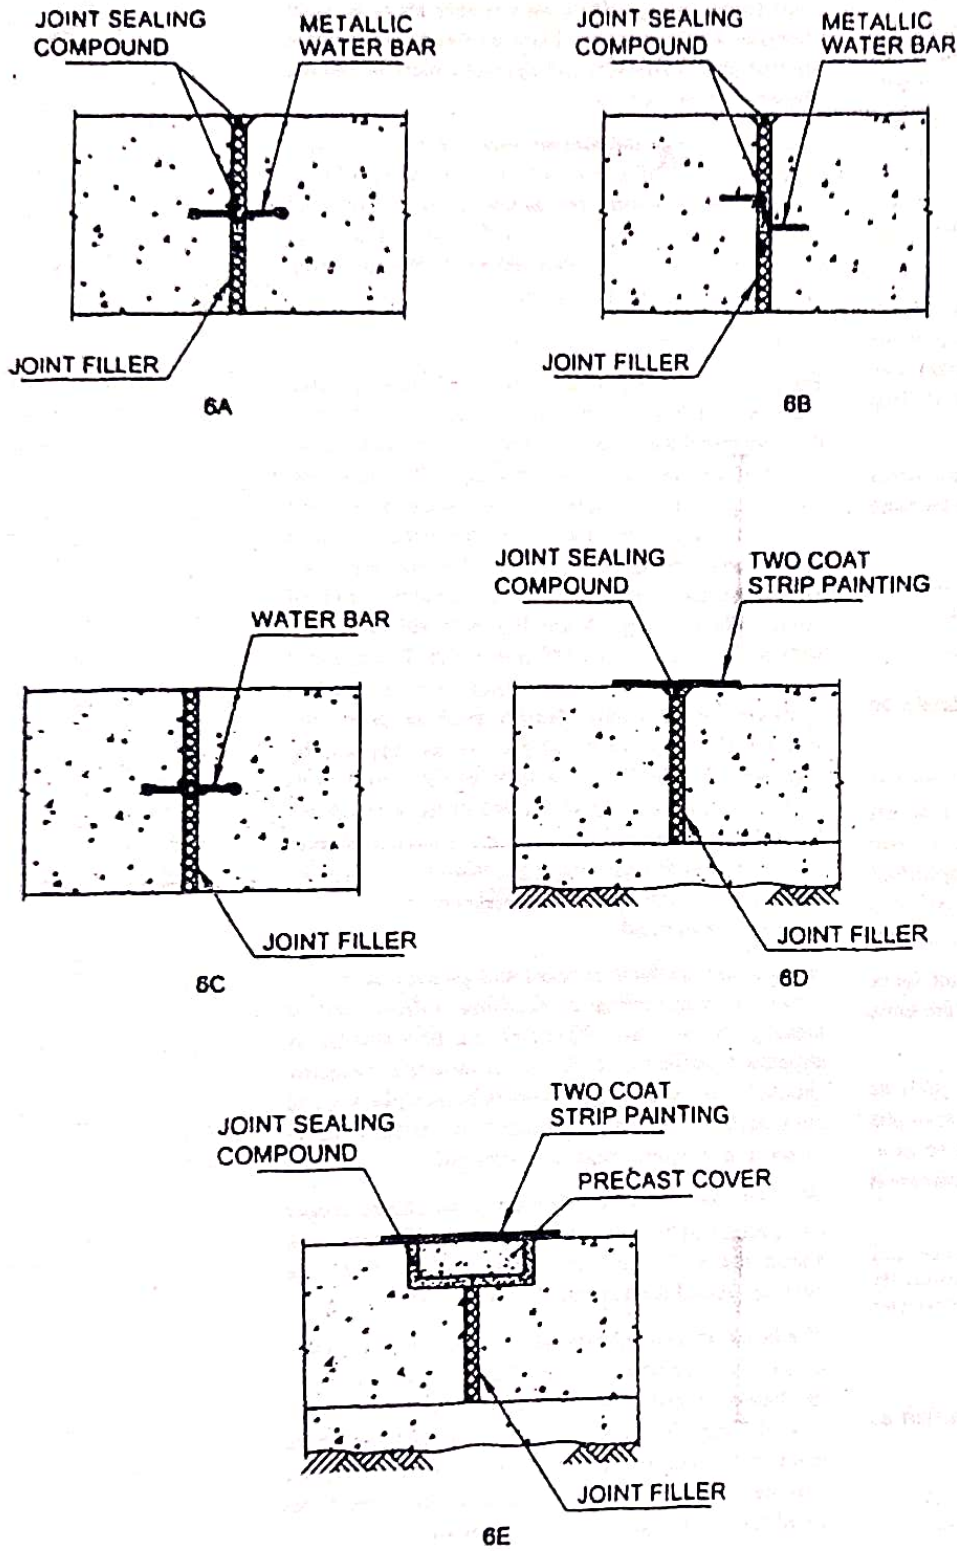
TYPICAL DETAILS SHOWING USE OF JOINTING MATERIALS IN MOVEMENT JOINTS (EXPANSION TYPE)
